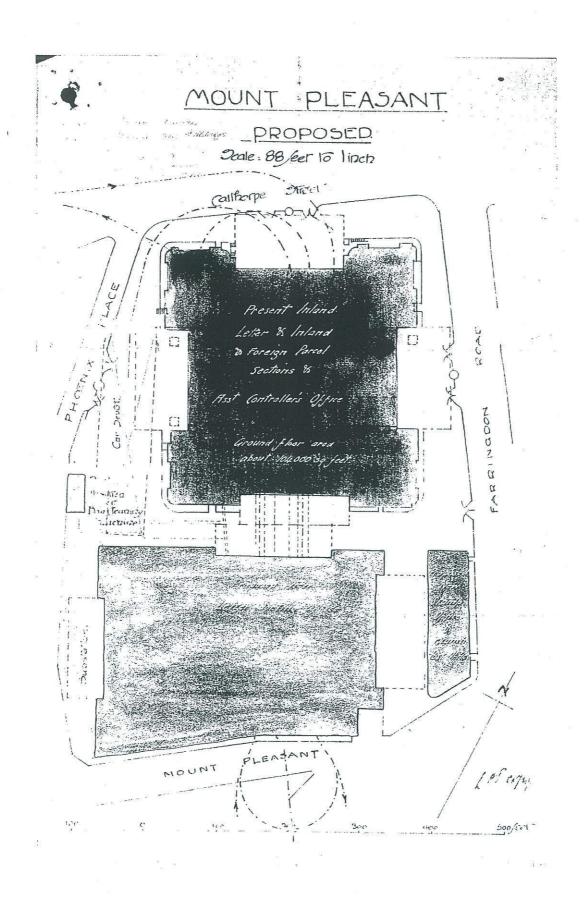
Plan showing proposed and existing buildings at Mount Pleasant, c 1914
